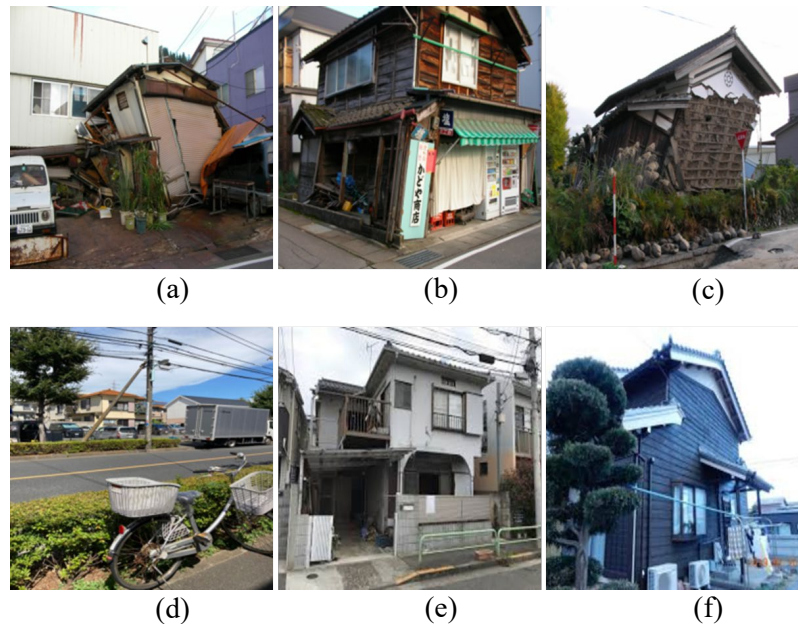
Examples of photographs in which the actual building were misclassified: (a) through (c) are photographs of damaged buildings judged to be undamaged buildings, and (d) through (f) are photographs of buildings judged to be damaged.
